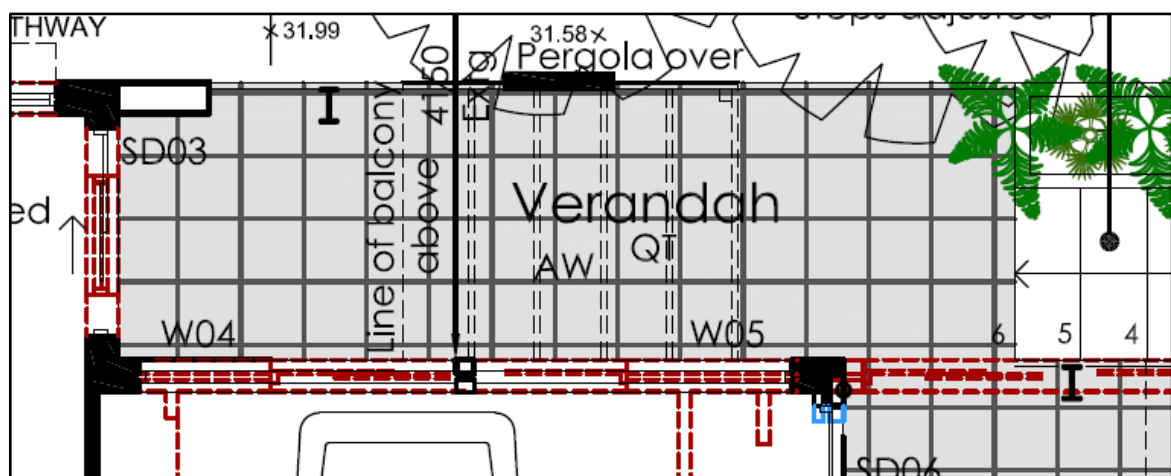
Snippet of lower ground floor plan detailing windows 4 and 5 adjacent to verandah.
